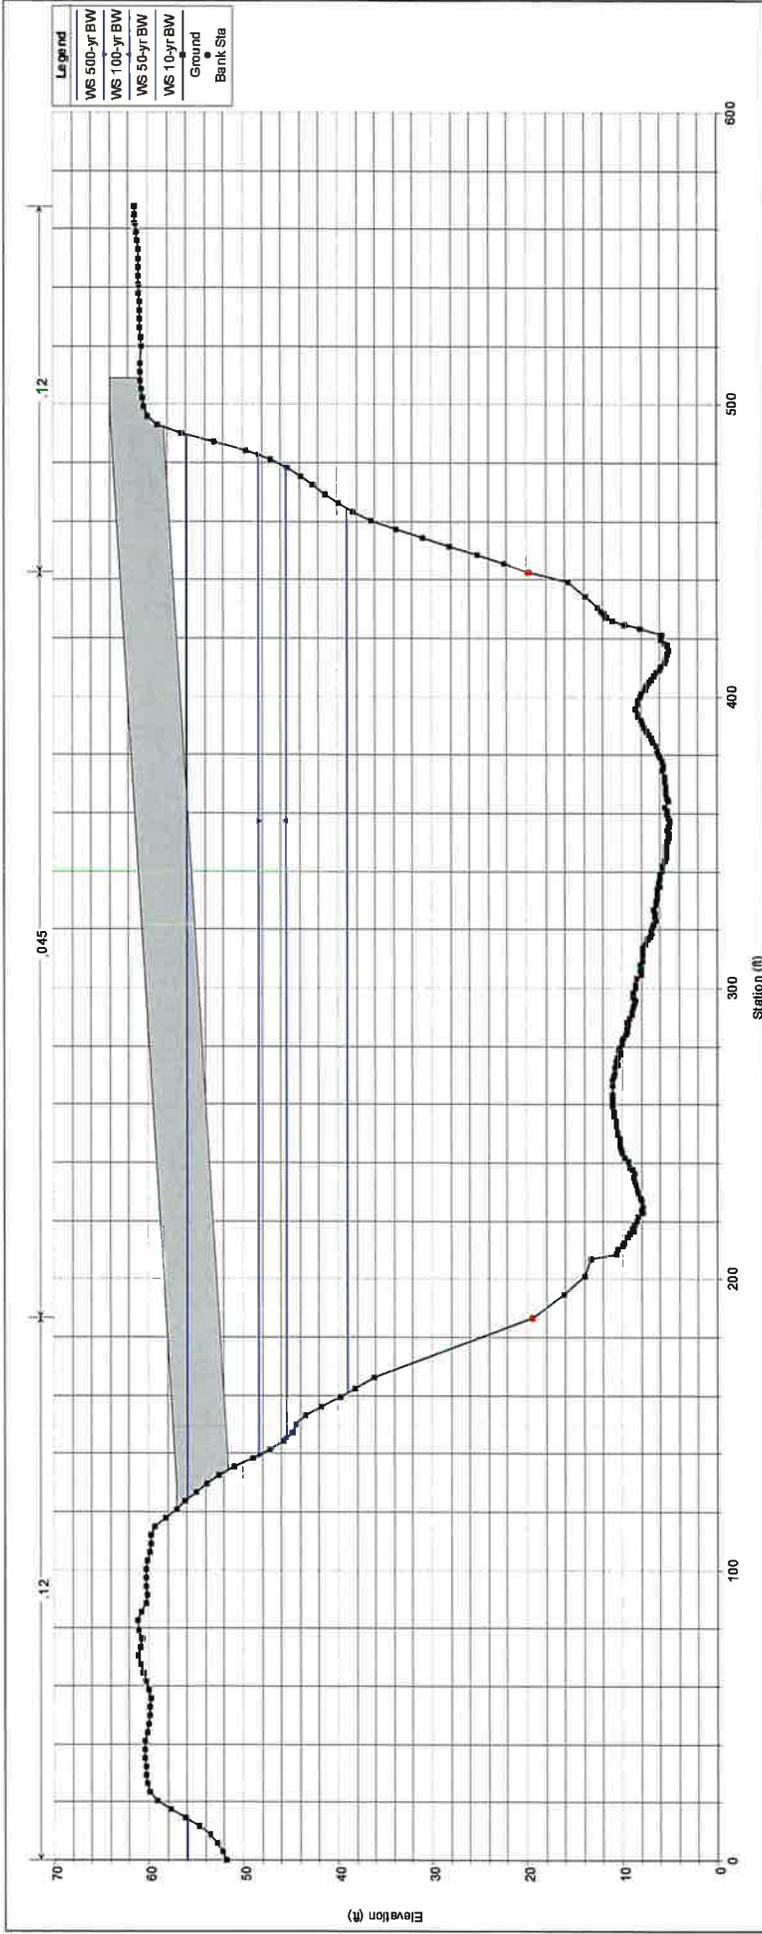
Downstream Bridge Cross Section for Alternatives 1/4
